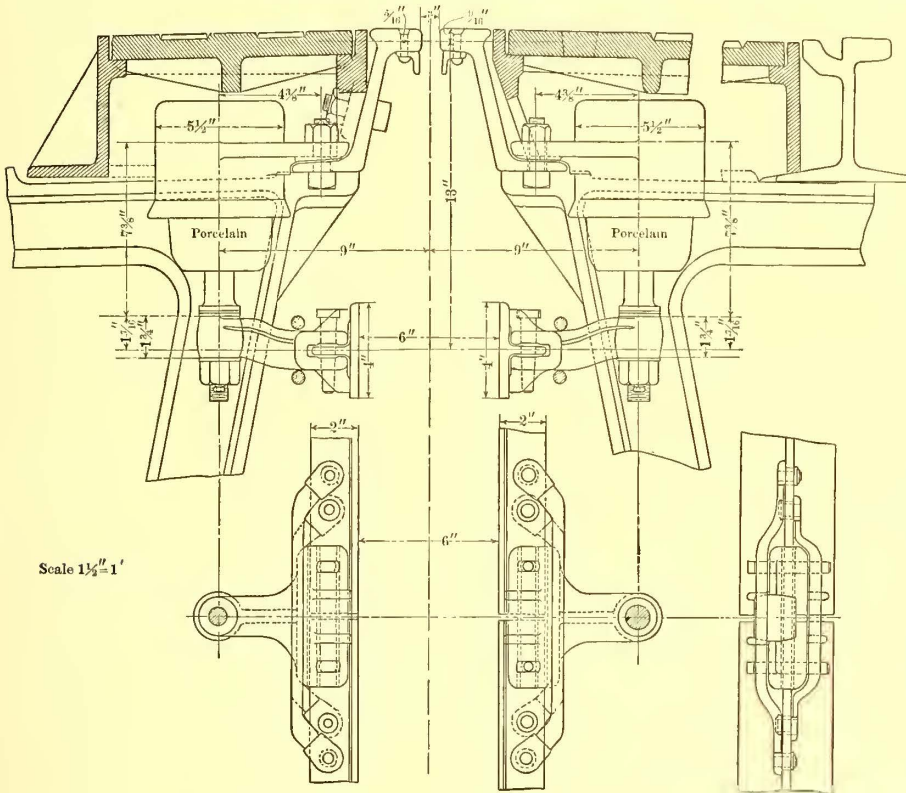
PLAN AND SIDE ELEVATIONS OF INSULATORS.
